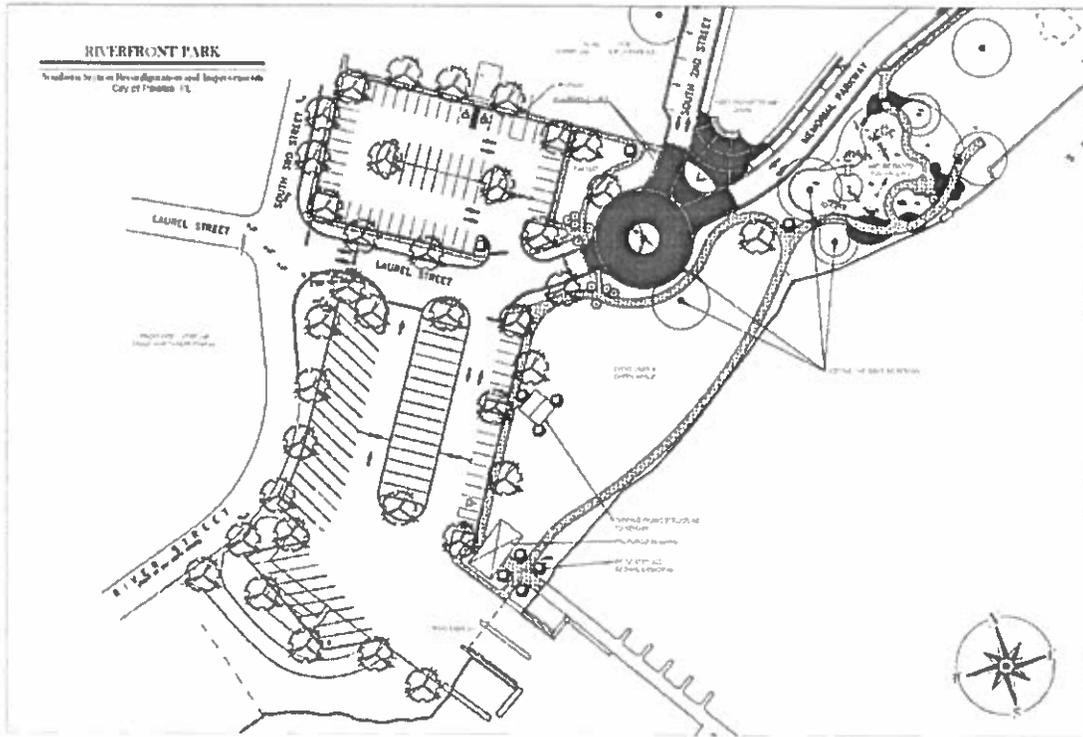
City of Palatka Riverfront Park southern improvements plan (Adopted 3-14-13).
